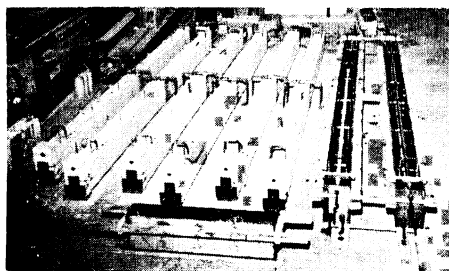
Laboratory site showing Beams 1-6, shrinkage specimens, dial gage frames, and forms for Beams 7 and 8
